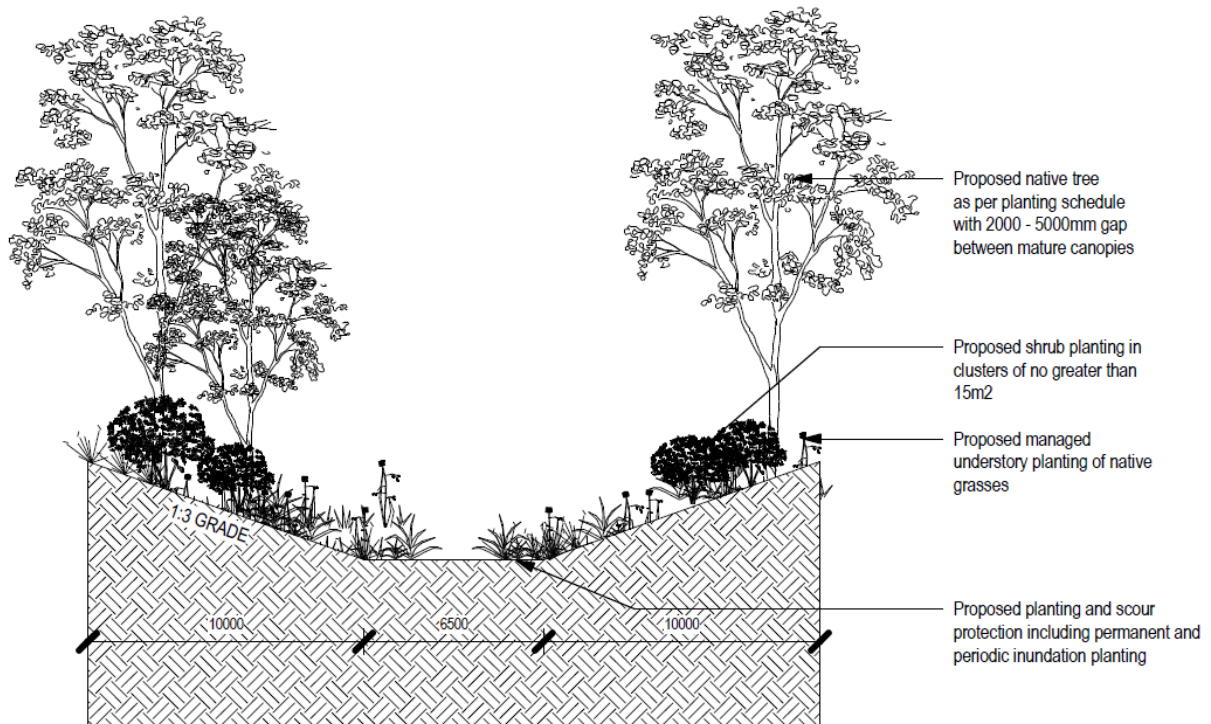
Typical section of Moore Gully realignment – creek and creek bank (Taylor Brammer, 2024)
